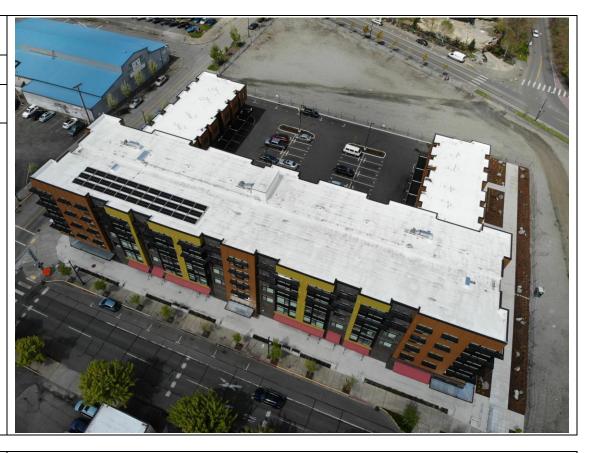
Completed Exterior Date: 9/9/2021 Direction Photo Taken: West Description: Exterior of structure along State Avenue NE completed. Photo No. 32: Final Building Completion Date: 11/24/2021 Direction Photo Taken: East Description: Exterior of structure along Jefferson Street NE completed.
